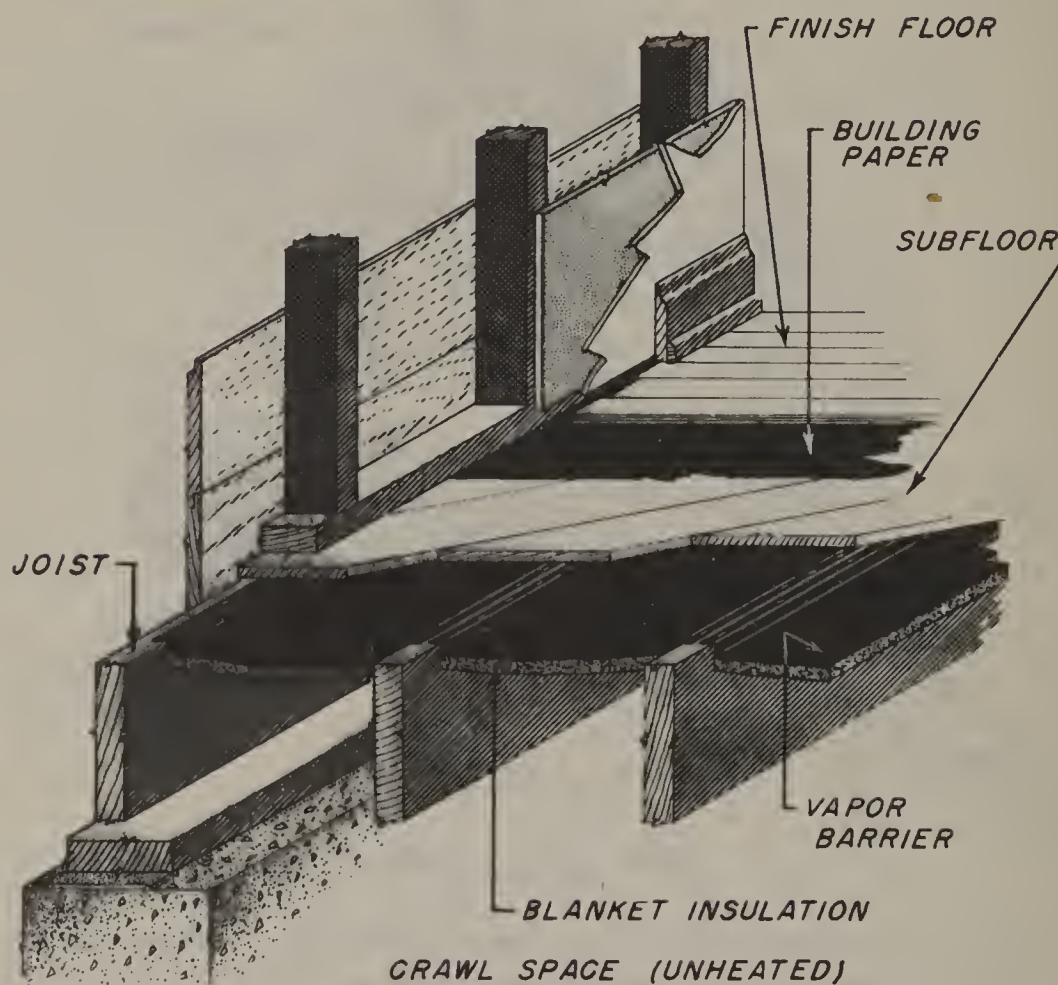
Basementless house, floor detail No. 3.* Condensation control in this detail requires the blanket insulation to be provided with a vapor barrier of good quality to prevent excessive water vapor in a damp crawl space from reaching the finish floor. It will also prevent water vapor from entering the blanket itself from the warm side. The only condensation problem that might occur in this construction would be in the blanket itself and no serious damage could result to the structure. The paper between the subfloor and finish floor may be a vapor barrier or any building paper of suitable quality. The thermal insulation illustrated is of a blanket type with flanges secured to the top of the joists by staples. The supporting paper is a strong material treated with asphalt capable of supporting the blanket under rather damp conditions and containing a lightweight insulating material. The heavy types of blanket insulation should be supported on good quality cord, wire, or wire mesh.
